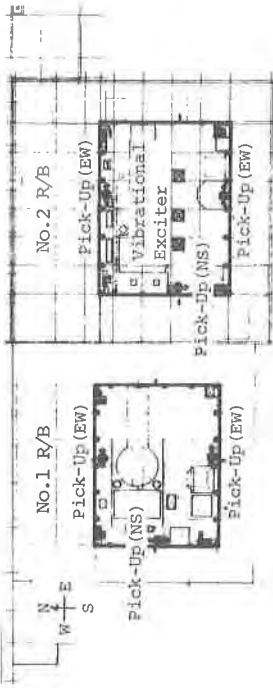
5th Floor Plan of No.1 and No.2 Reactor Buildings and Position of Exciter and Pick-Ups
